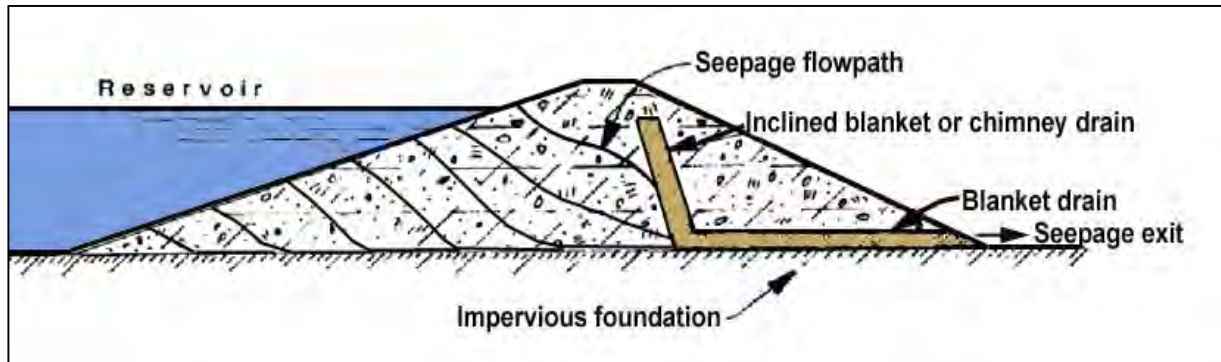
Chimney and blanket drain inside a homogeneous-fill dam on an impervious foundation.
